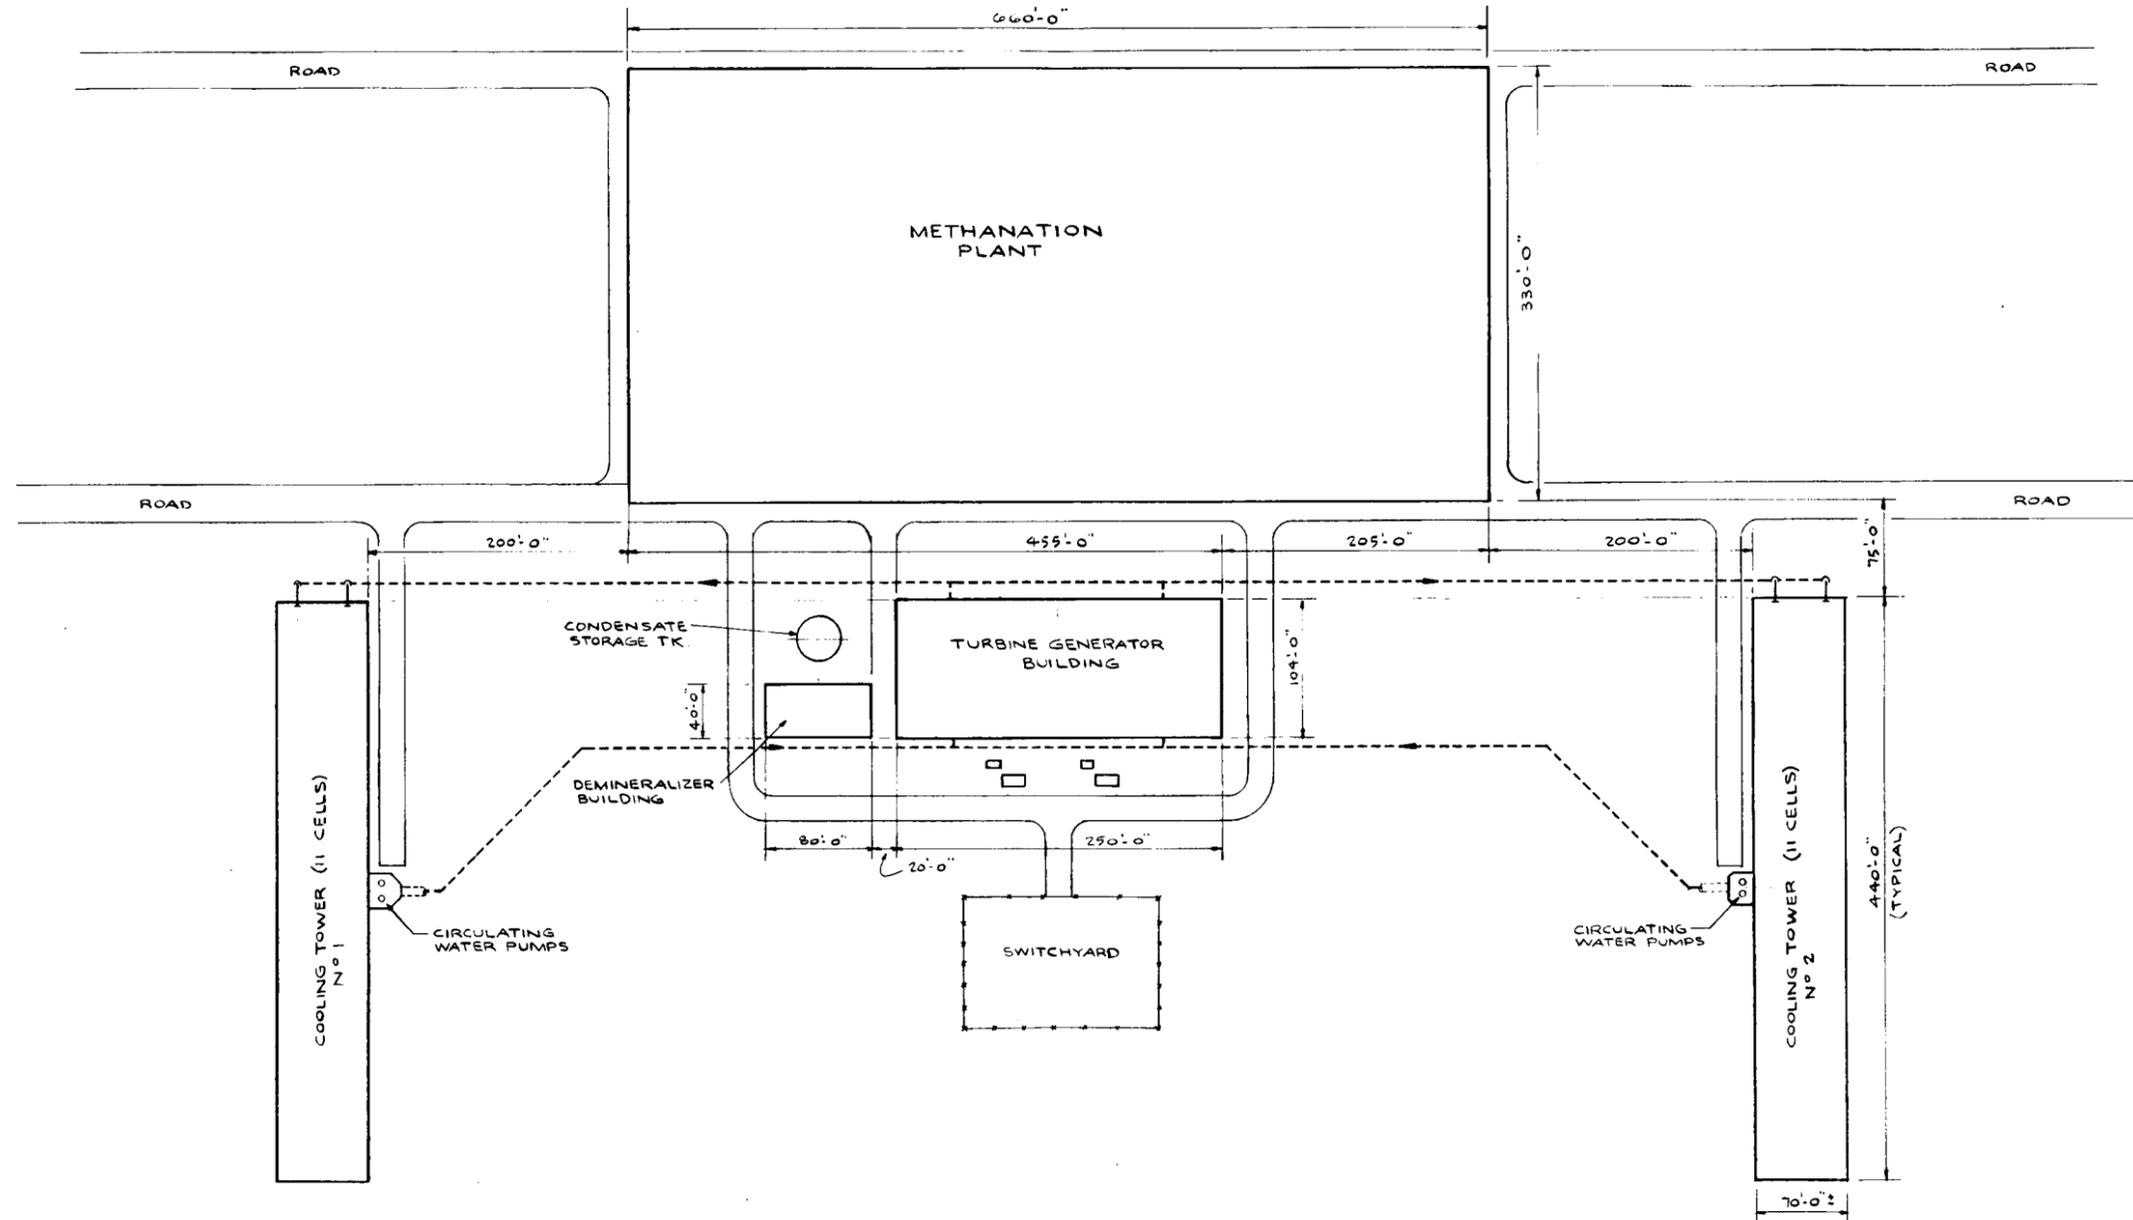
General Arrangement Plot Plan of Load-Following Electricity Plant
